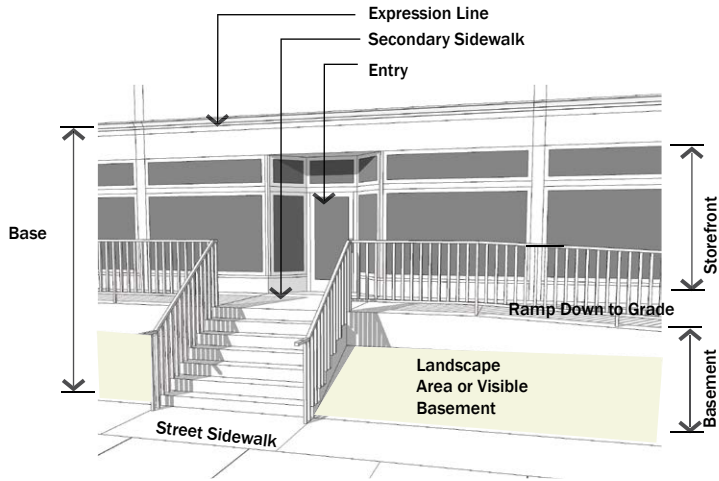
I (2). Elevated Storefront Entrance Type.
